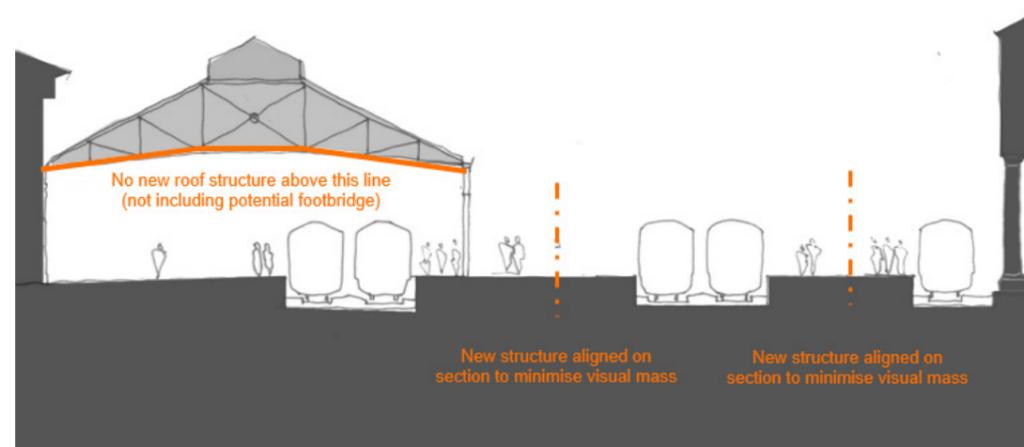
New structure kept clear of Roof A gable; columns aligned on platform
